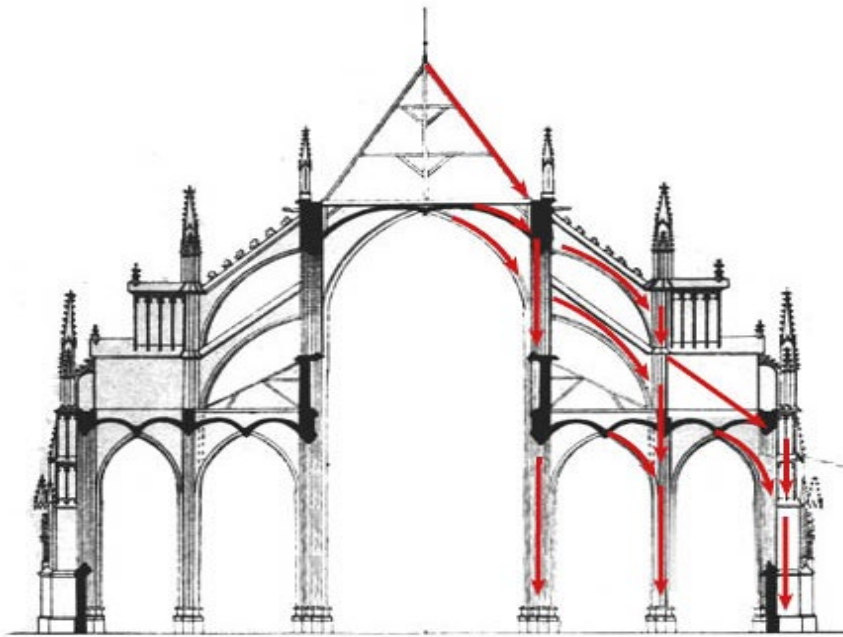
The way down of the forces from the roof down to the ground⁵⁸
